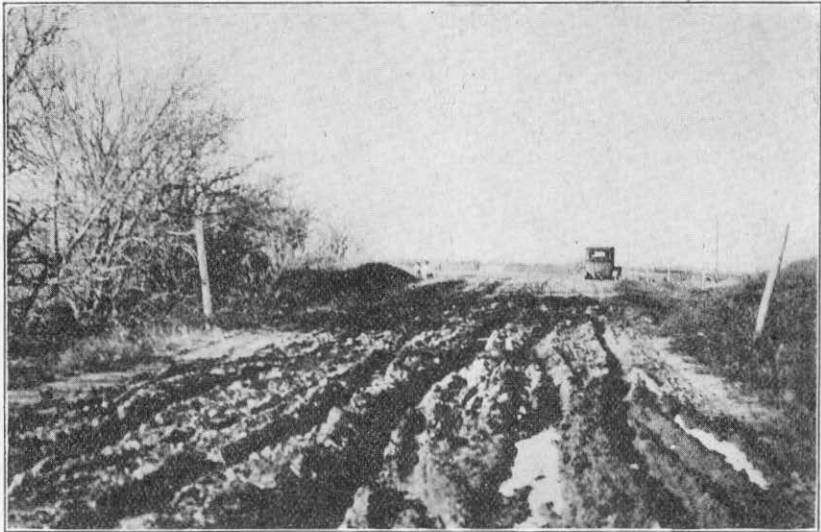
A Bad Road Resulting From Poor Cross Drainage. Photo by A. S. Mirick.
